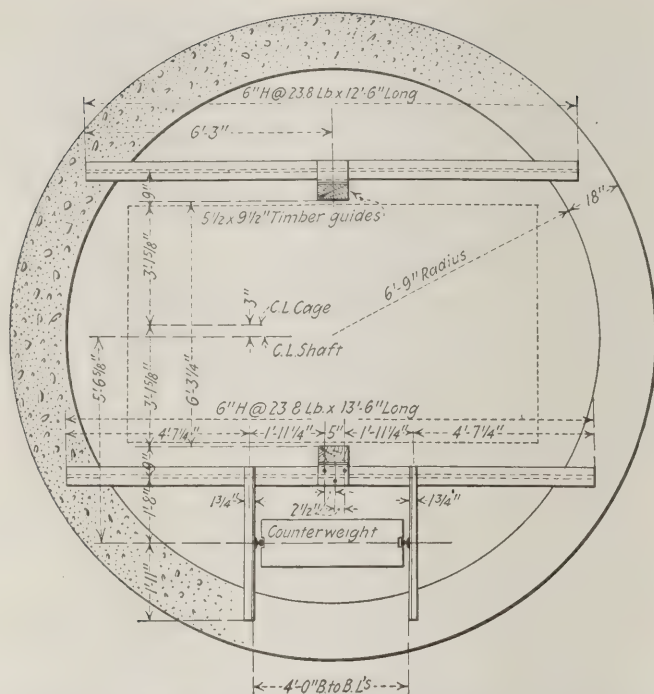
CROSS-SECTIONAL PLAN OF AUXILIARY SHAFT
